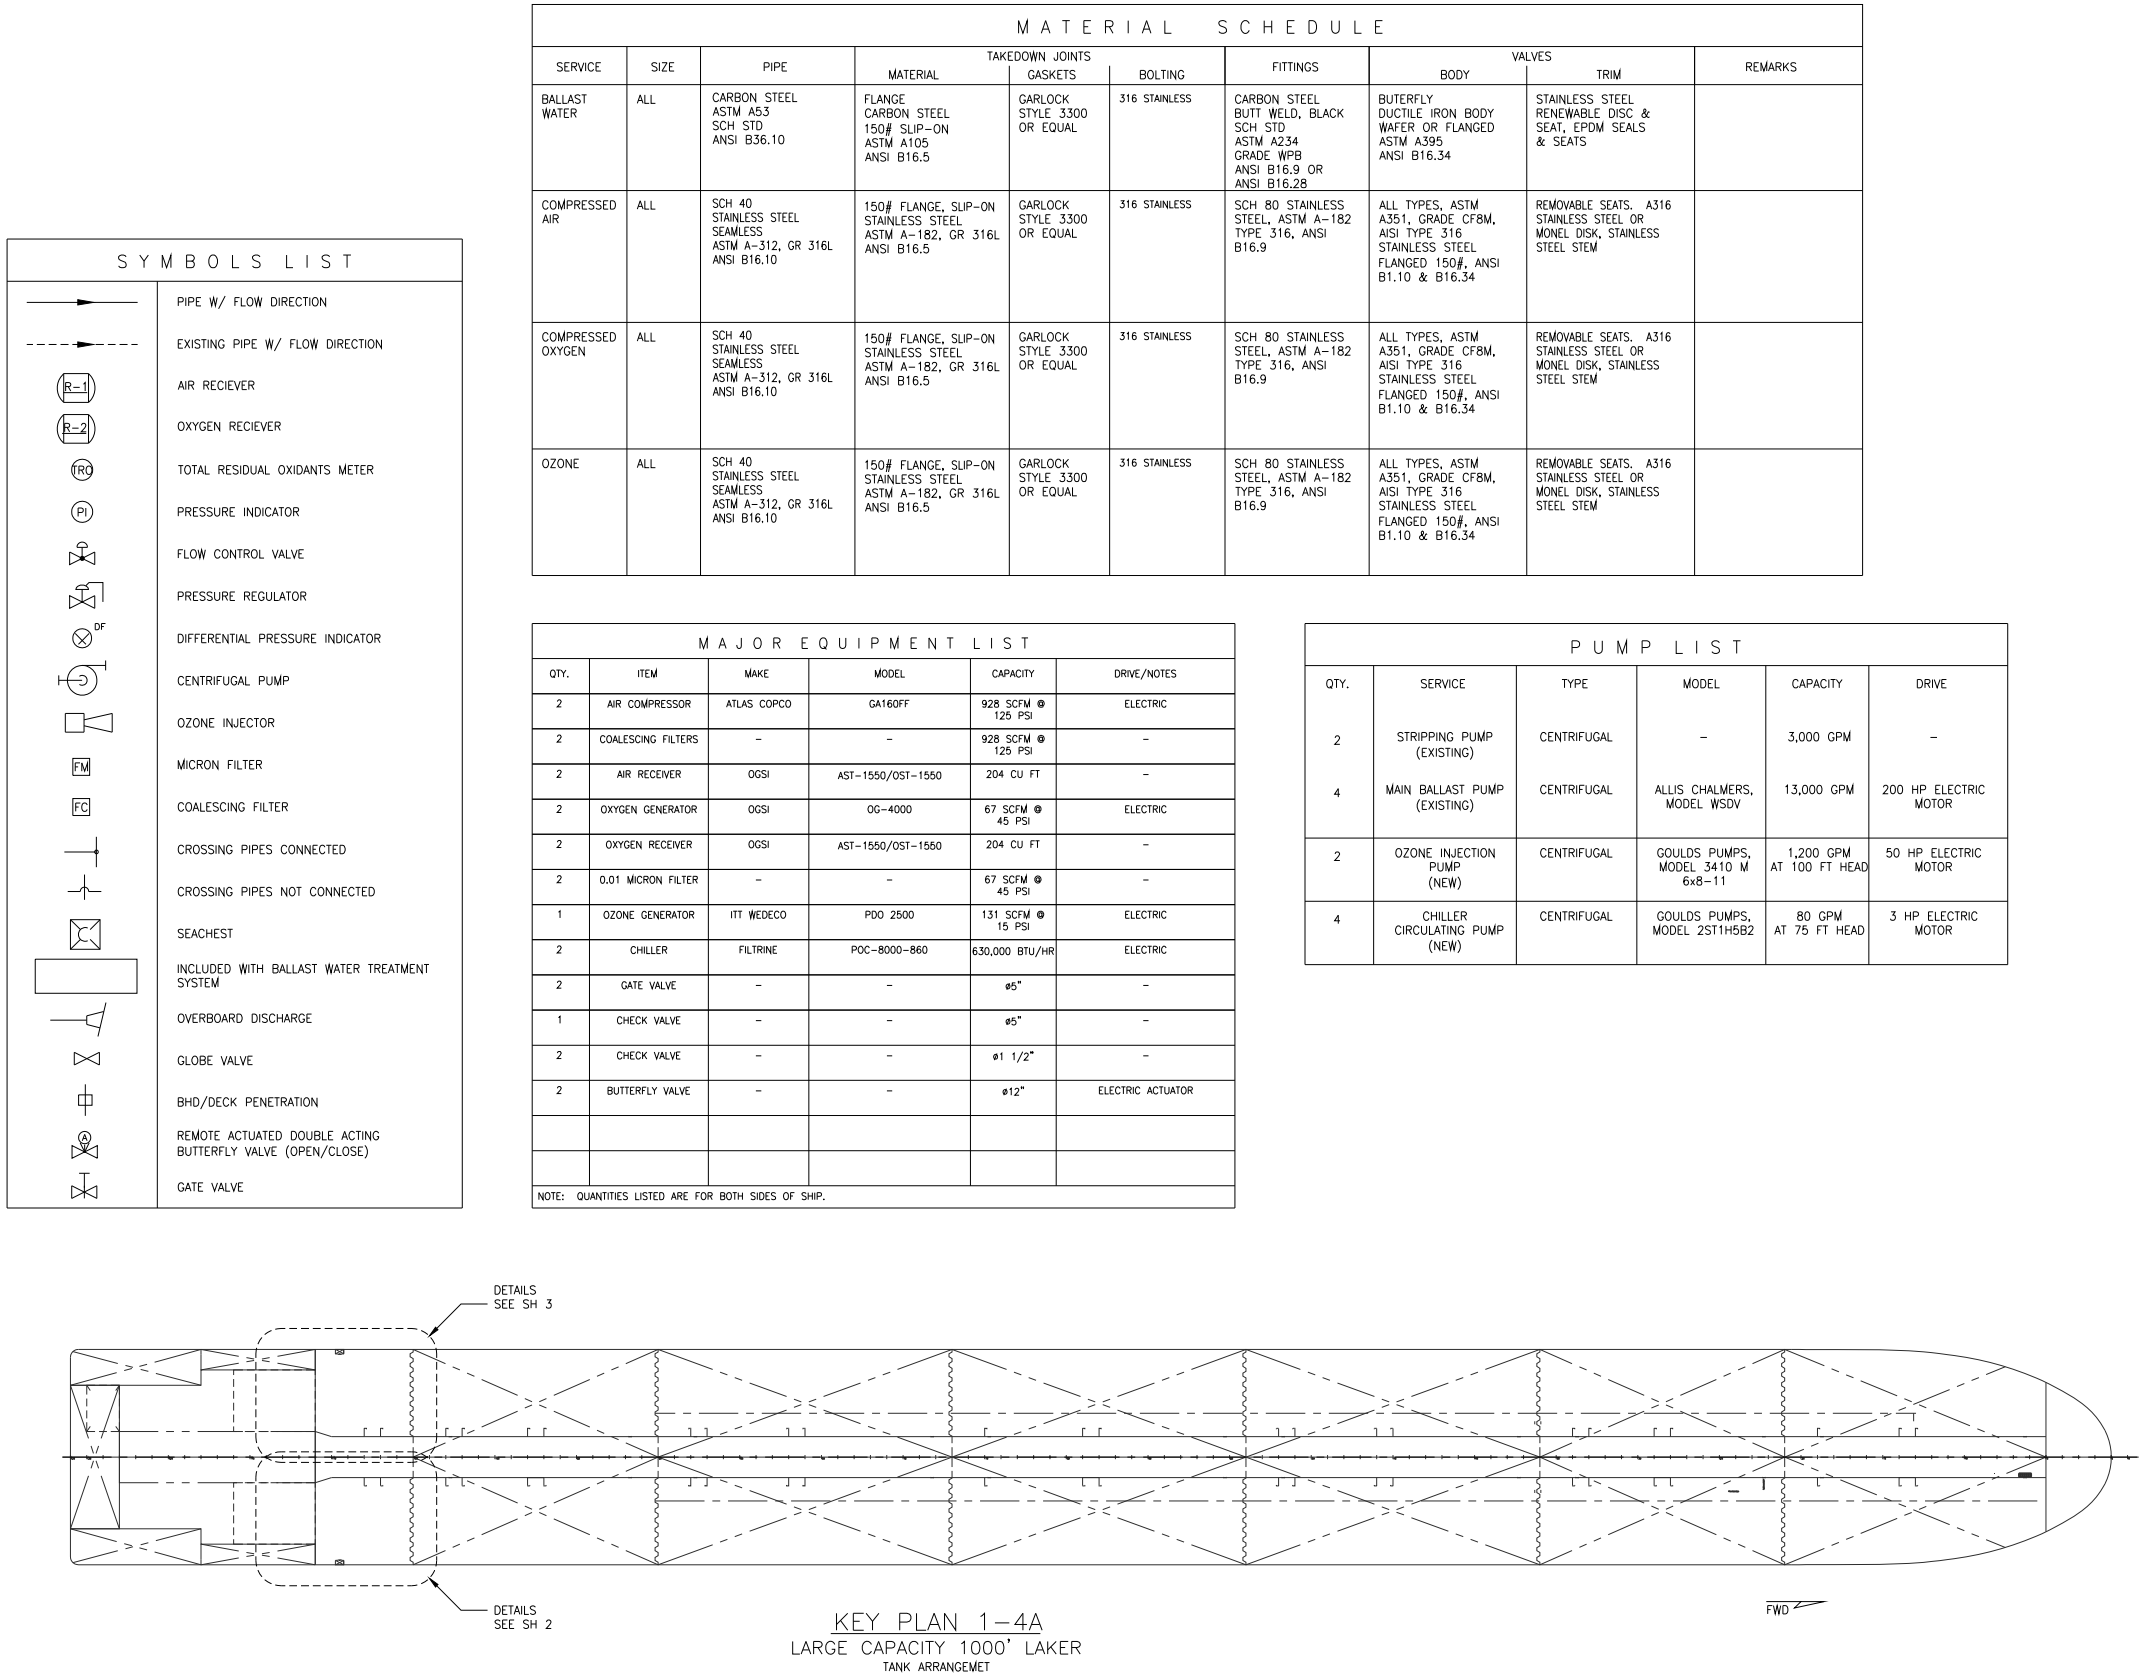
Vessel Two, BWT System 2 (ozone BWT System): general arrangement and piping installation (4 of 4).
